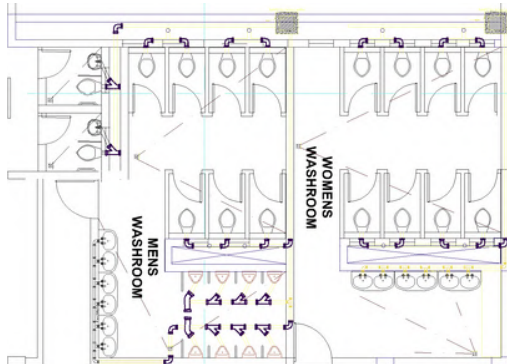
TOWER A BATHROOM PLUMBING LAYOUT
